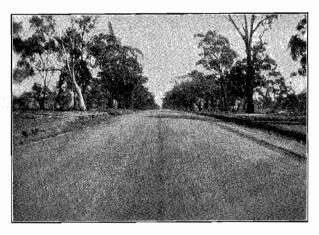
Sprayed Road Pavement between Avenel and Longwood, consisting of granite or natural earth selected from borrow pits on the roadside during forming.
